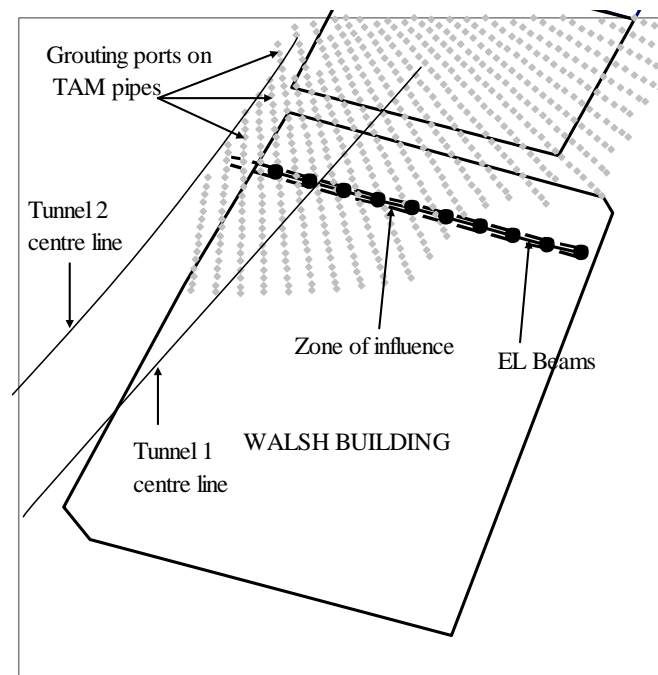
Arrangements of TAM Pipes under Walsh Building.
